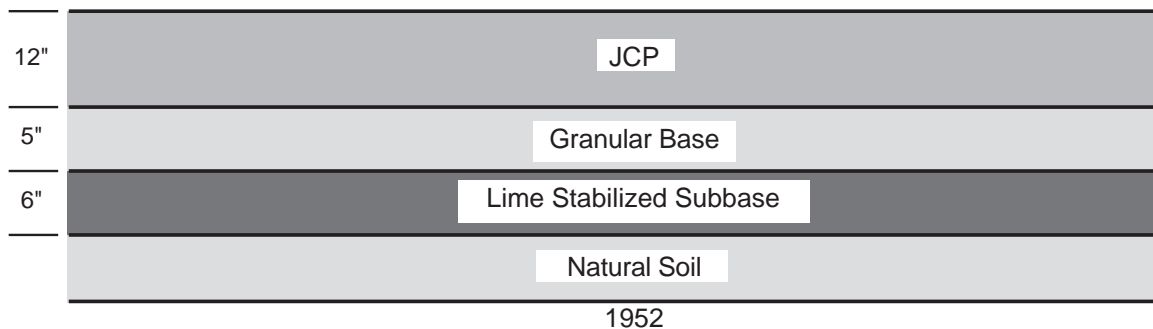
Initial cross-section of pavement on IH 35 southbound near West, Texas
